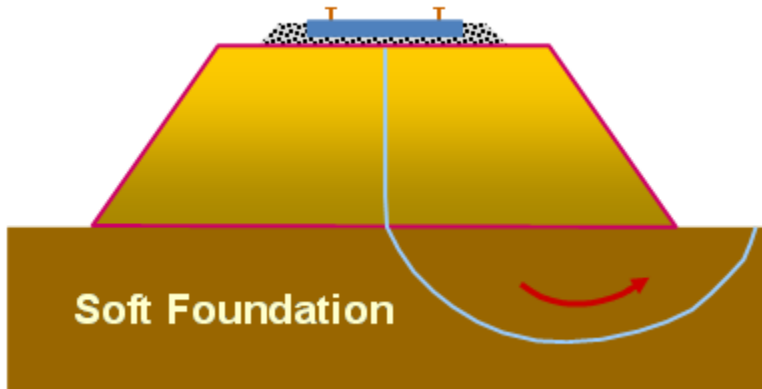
Embankment foundation failure (Selig, 2013)
